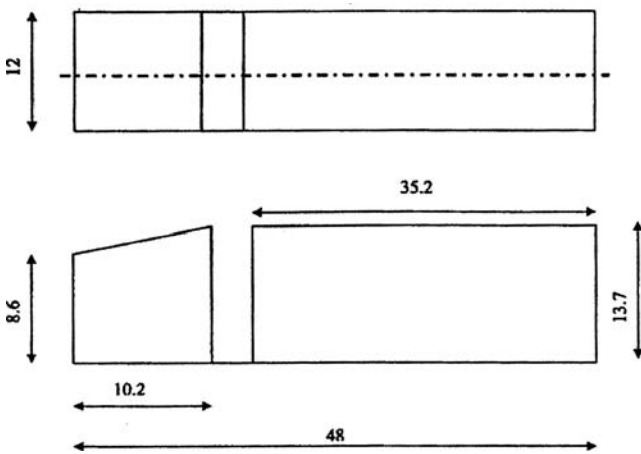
Top: plan of the testing model; Bottom: elevation of the testing model (all dimensions are in cm)
